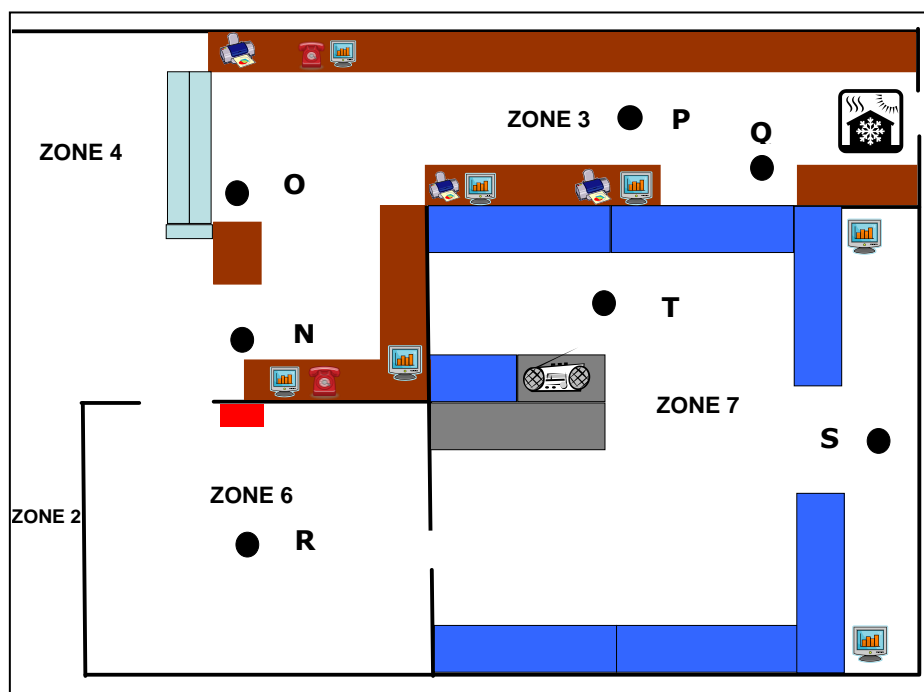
Floor plan zones 3, 6 and 7. Sampling sites (●).
